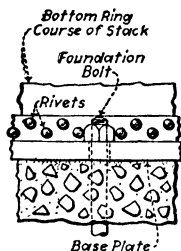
Showing double-stagger riveted joint at base of stack.
